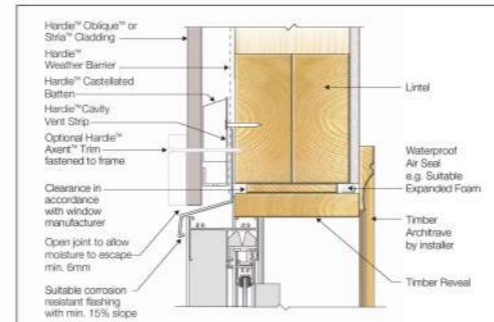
WINDOW HEAD AND SILL - TRIM
